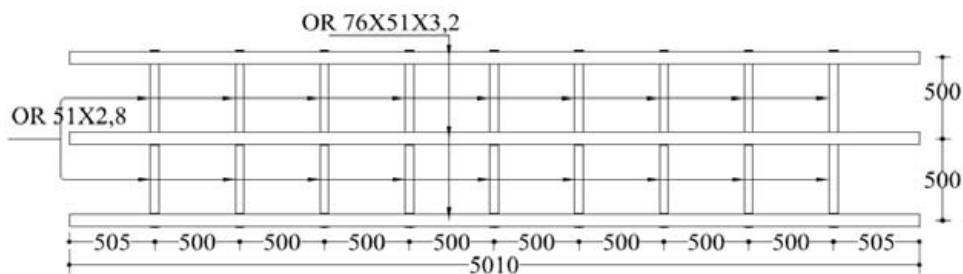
Geometry of the scale steel bridge adopted as example (units: mm)
